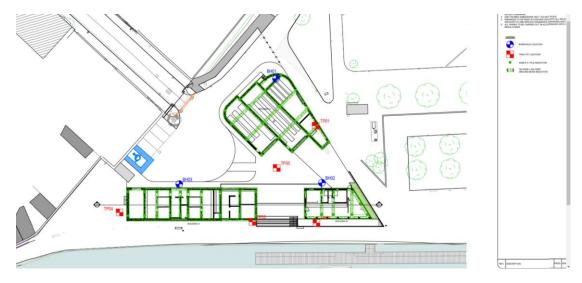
Geotechnical borehole and trial pit locations on proposed development layout (DRA Consulting Engineers).
